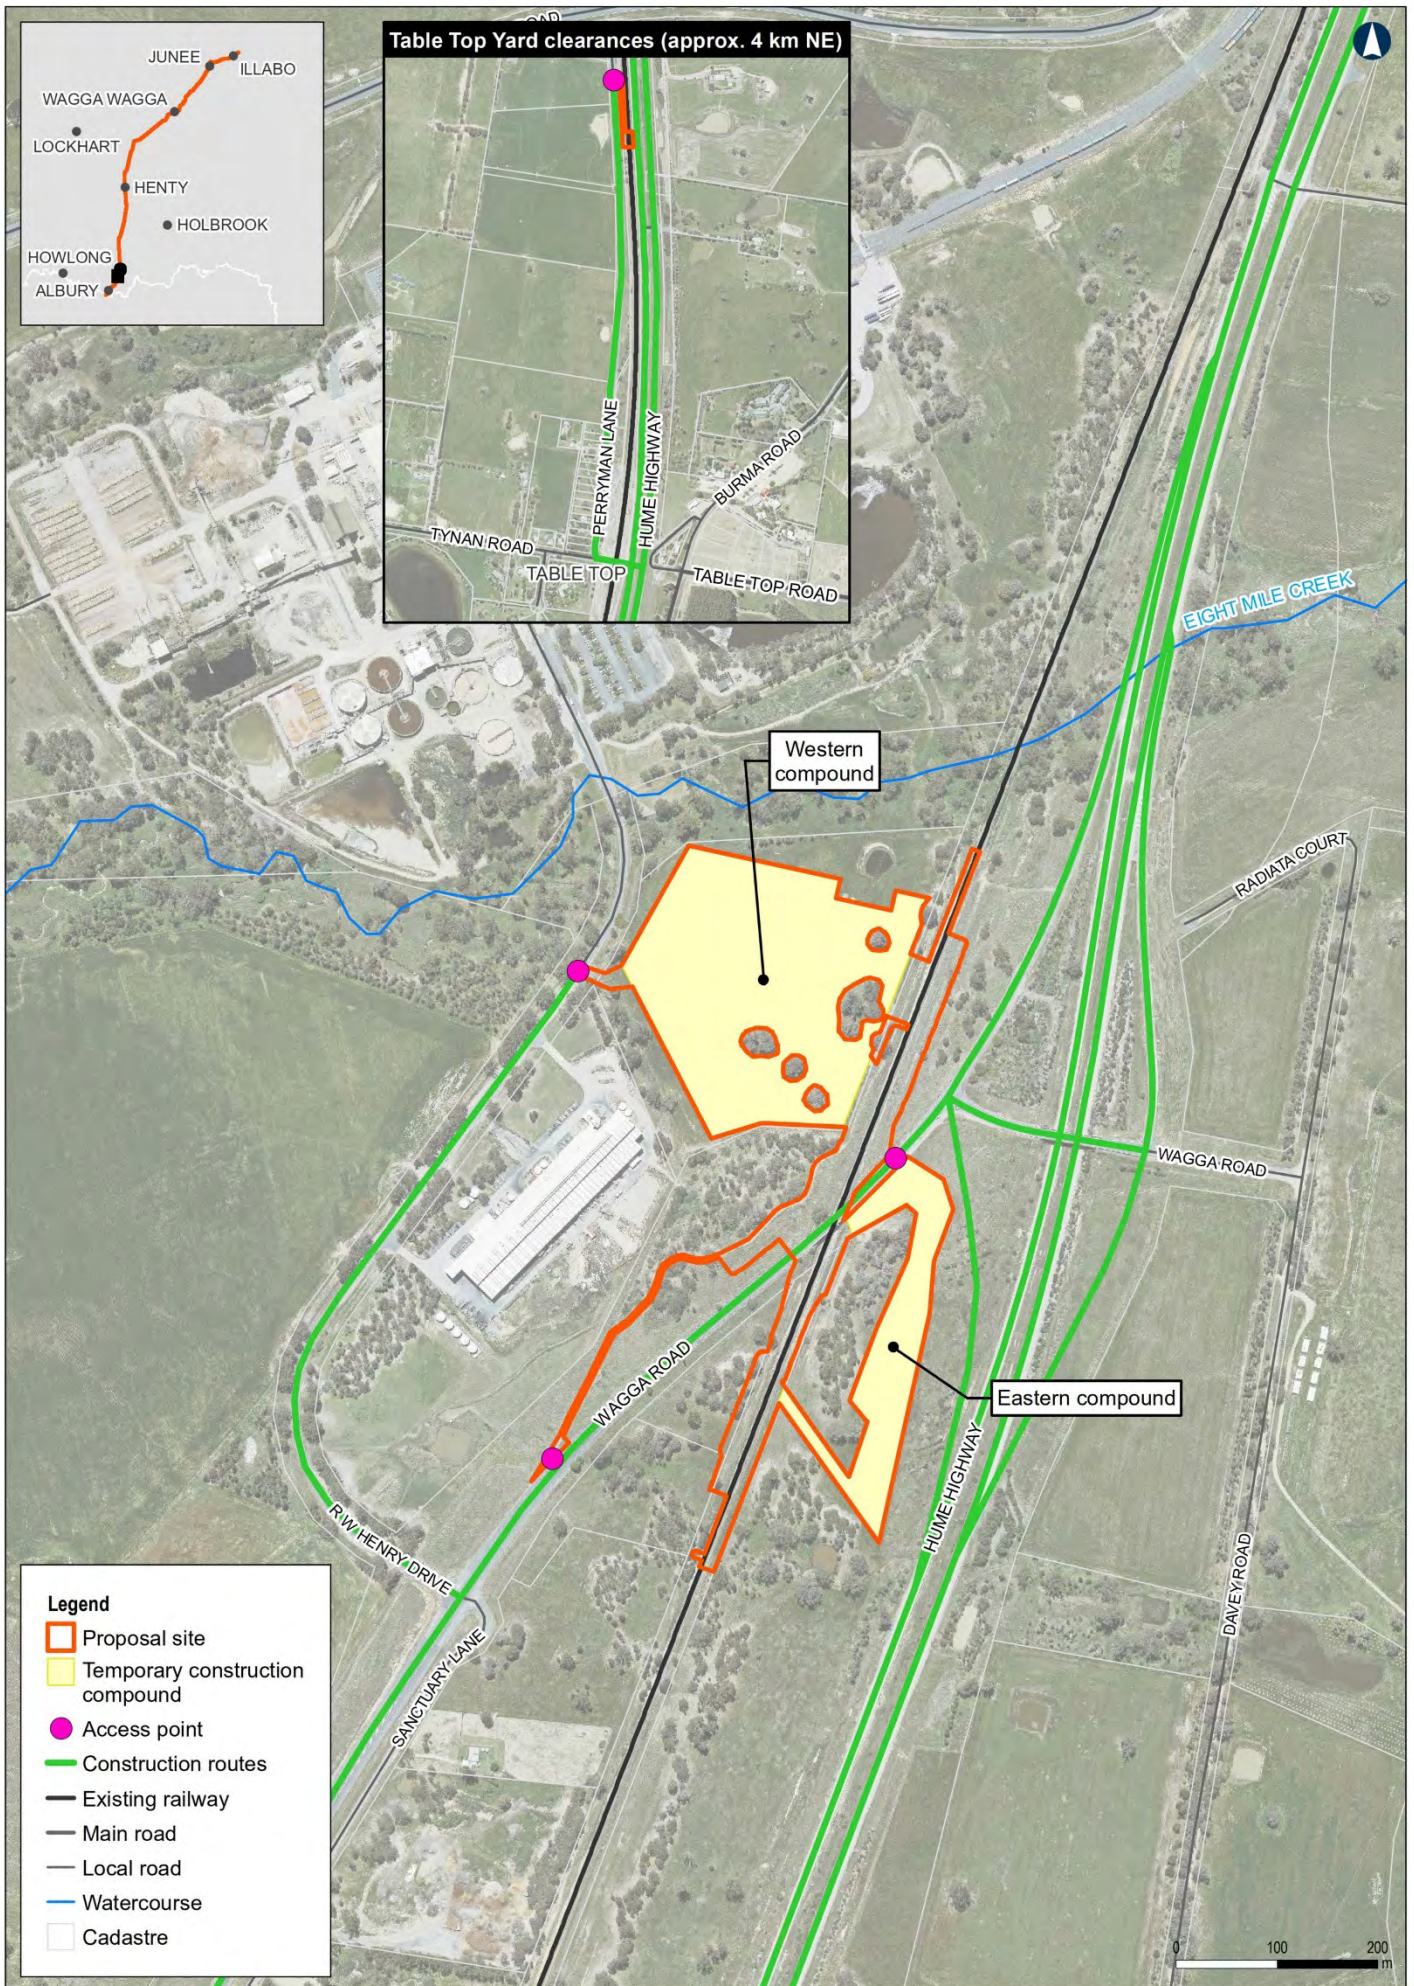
Construction layout of Billy Hughes bridge and Table Top Yard
